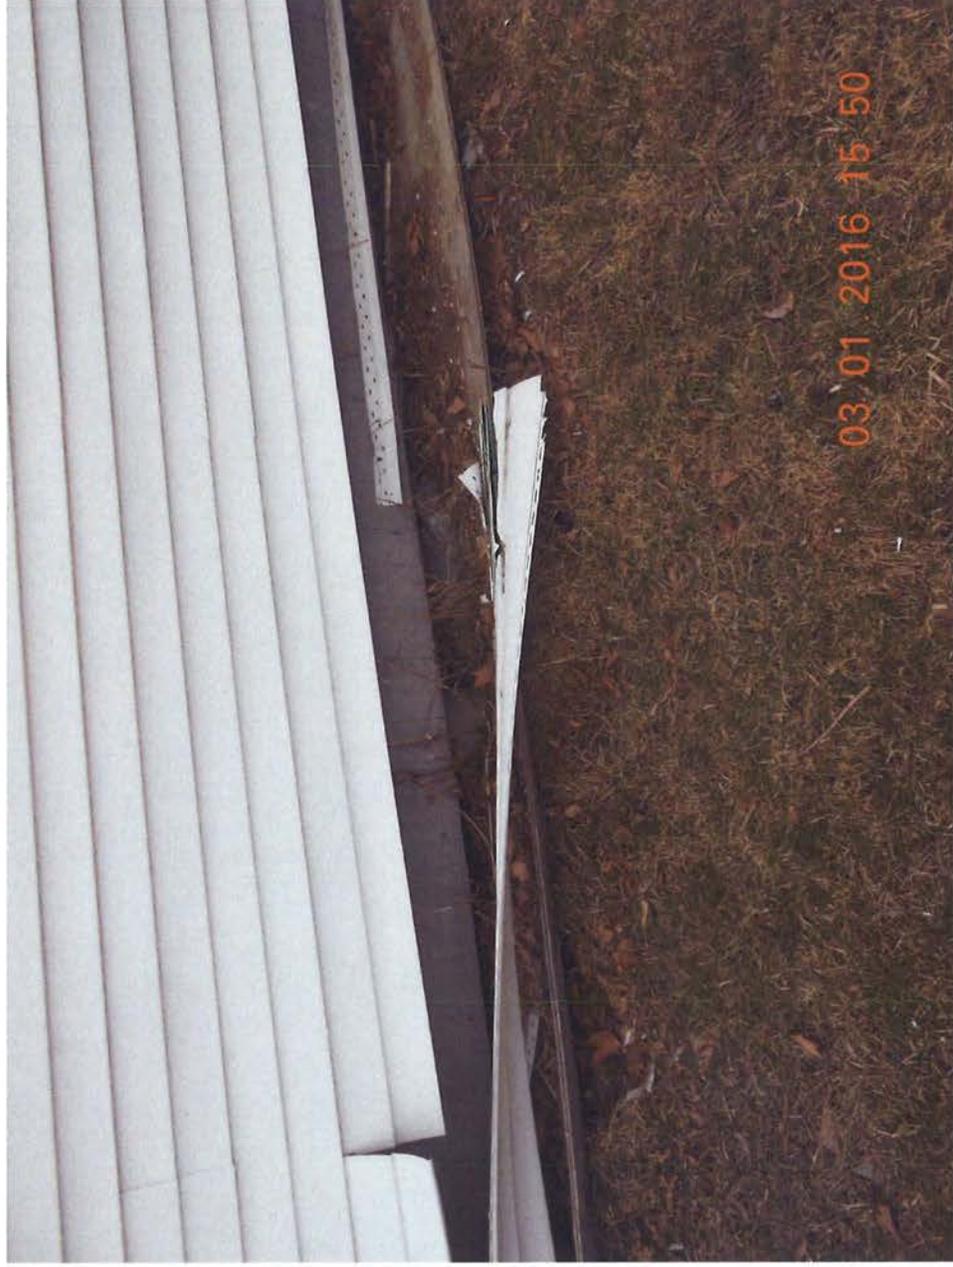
shows more failing siding attachments allowing for its collapse from the building.
